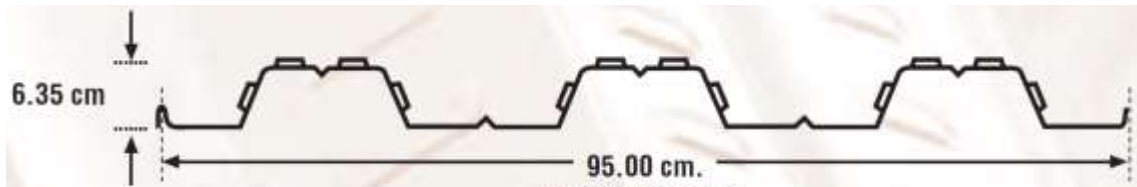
Losacero Section 4 with dimensions in [cm] (IMSA)
